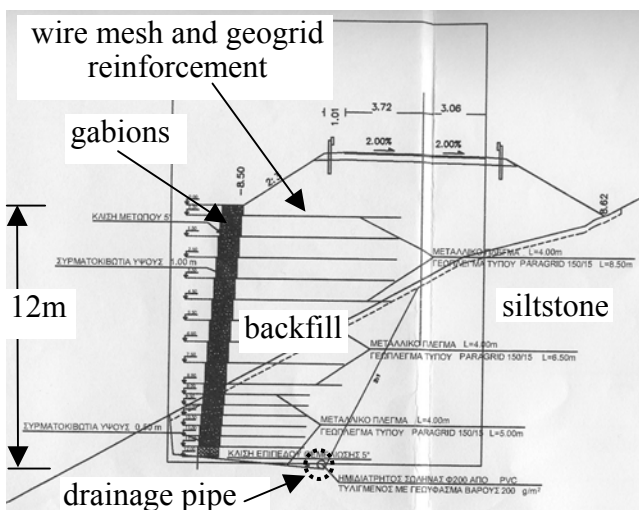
Cross-section of the reinforced wall and embankment considered in stability calculations.
